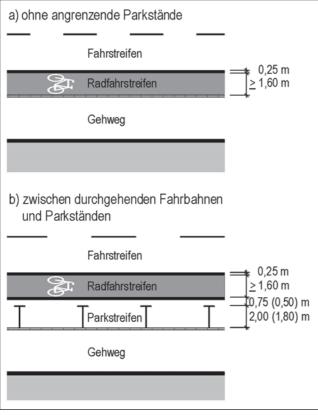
Example dimensions of on-street cycle lanes without car parking and alongside parking bays
